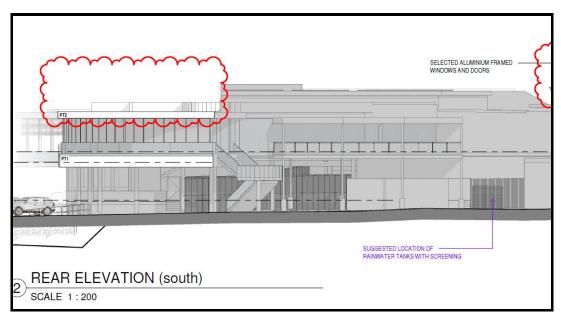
Removal of roof terrace and inclusion of parapet (Source: Innovate, Revision F)
